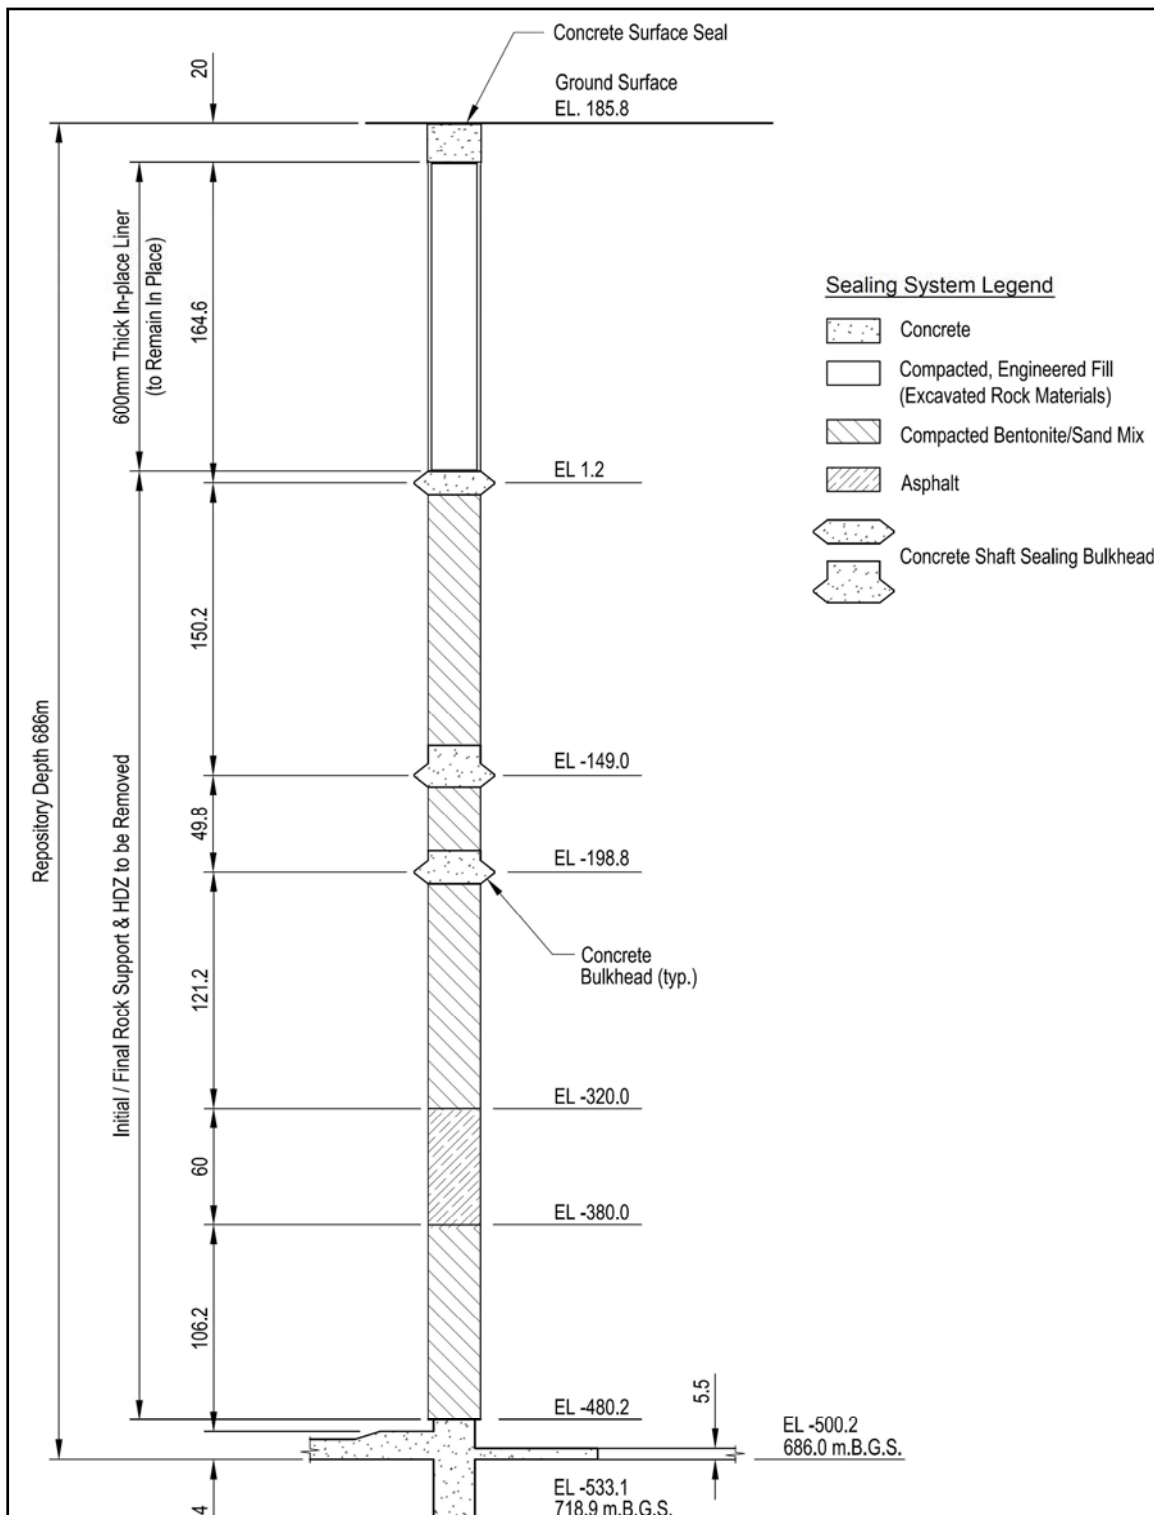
Arrangement of Shaft Seal Components
